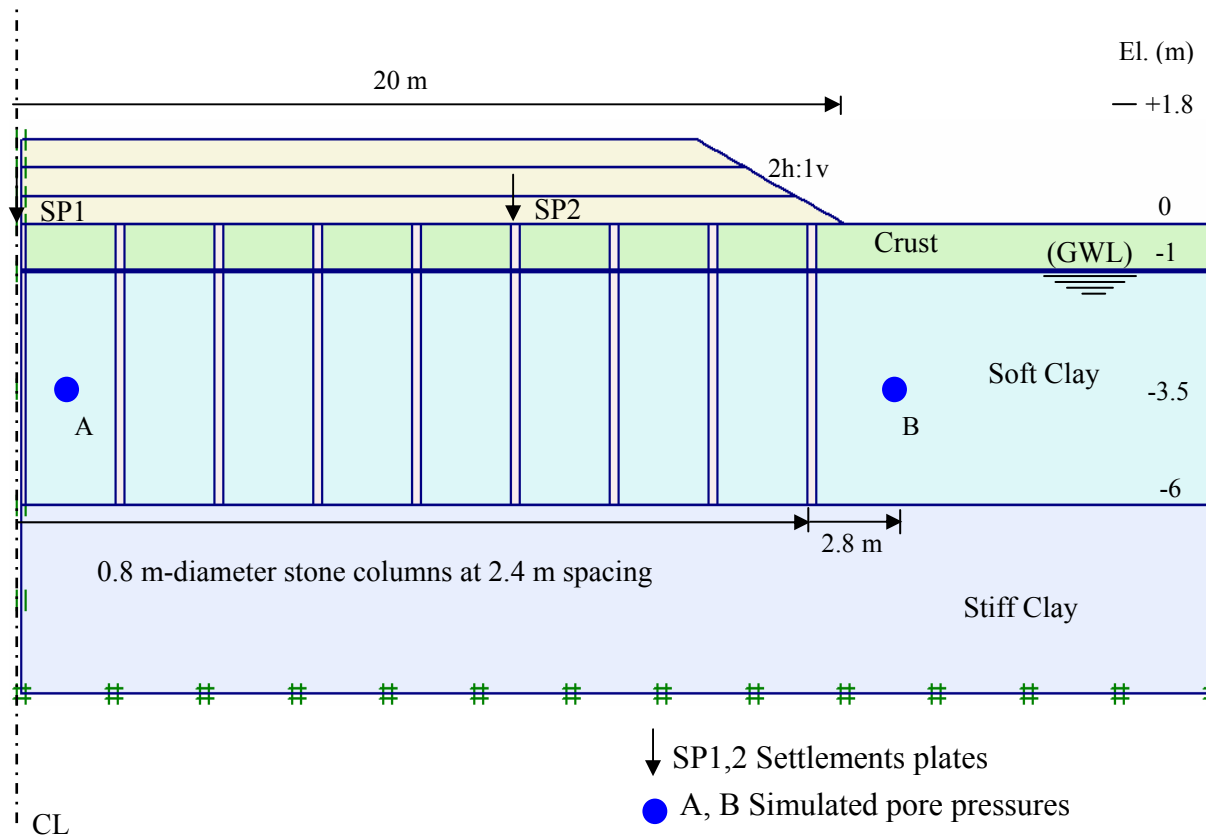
Cross section of embankment case history through centreline of stone columns
